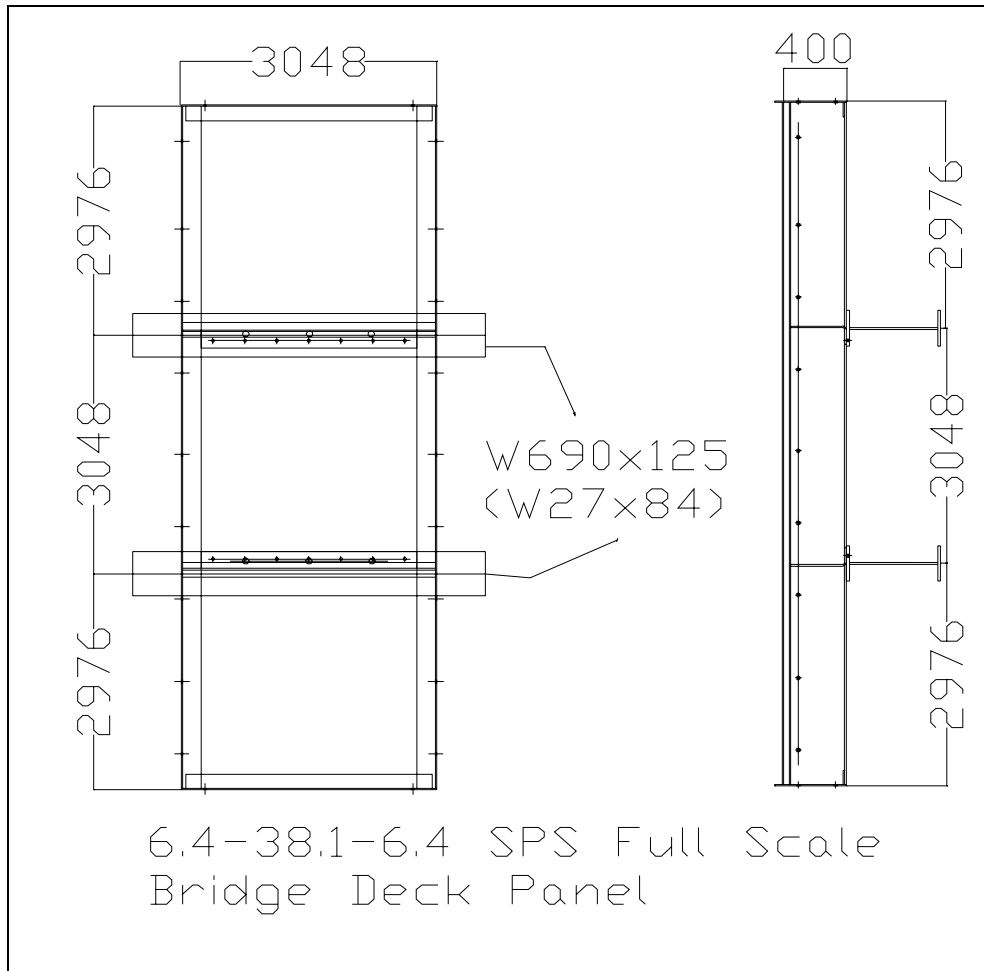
SANDWICH PLATE SYSTEM BRIDGE DECK PANEL
